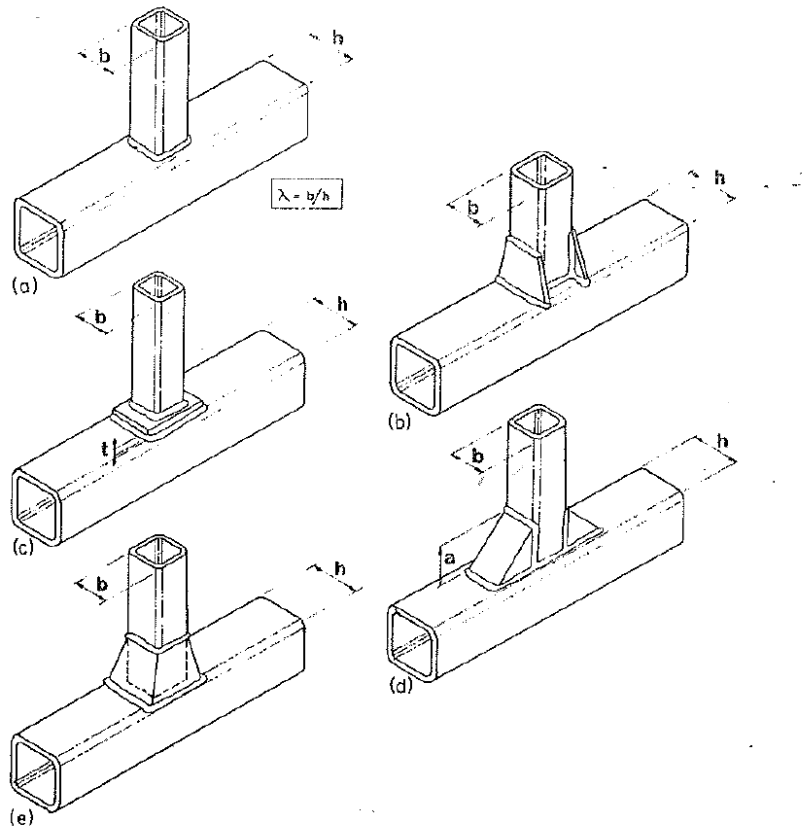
Vierendeel truss connections (a) unreinforced, (b) branch flange reinforcing plates, (c) chord flange stiffener, (d) haunch, (e) truncated pyramid (Korol et al. 1977)
